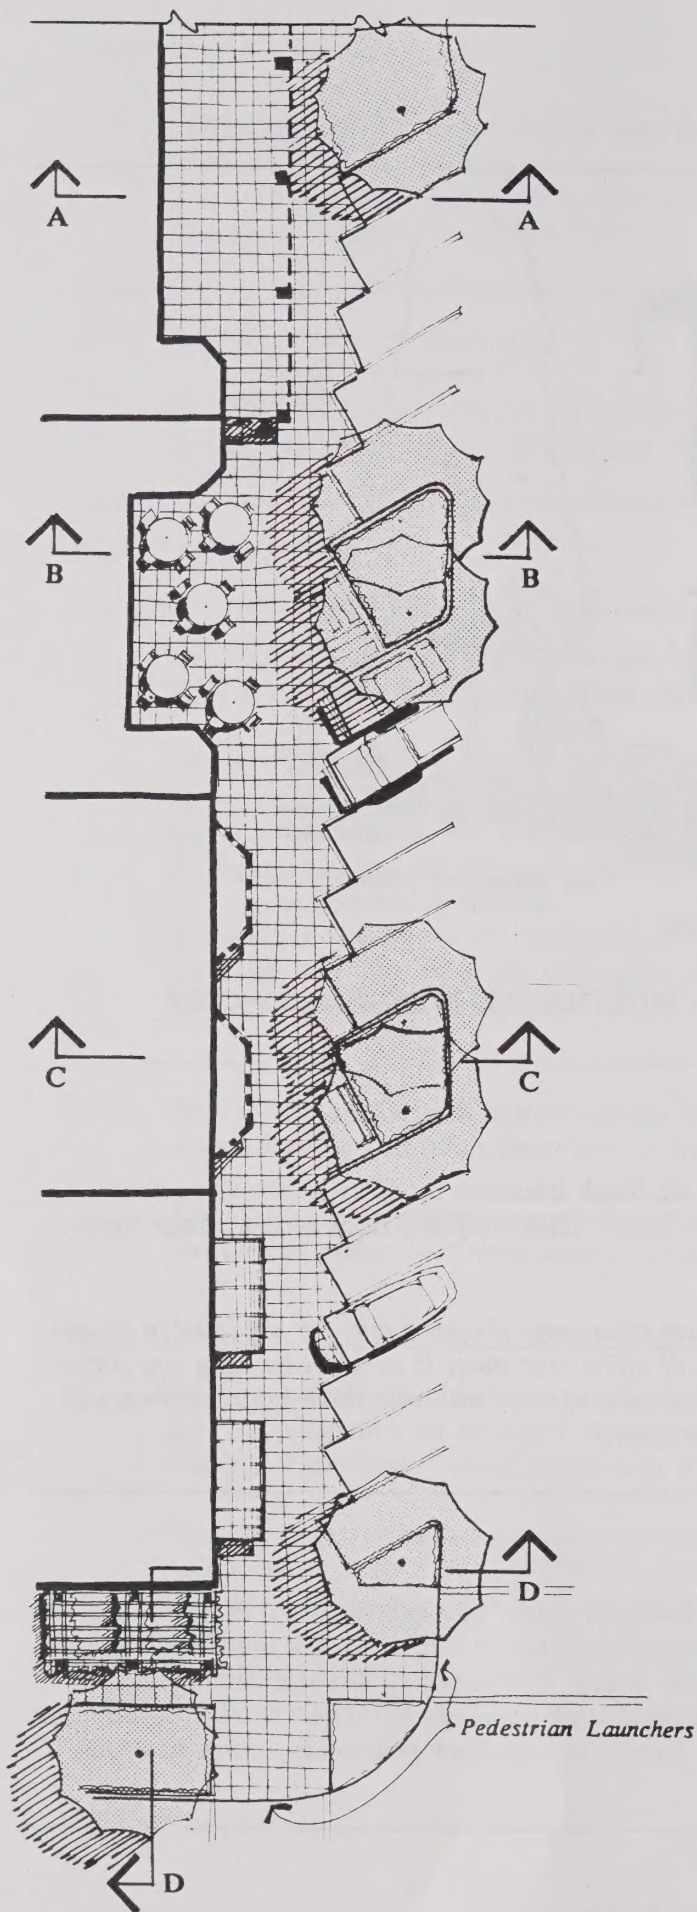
CORE AREA STREET WALL AND SHADED SIDEWALK CONCEPTS
